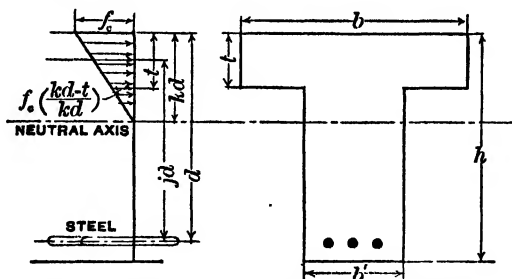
Resisting Forces in T-shaped Section of Beam. (See p. 755.)
